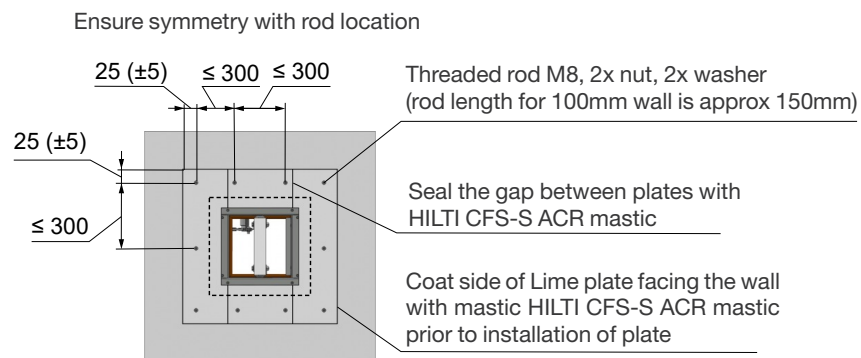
Outside solid wall construction - mineral wool, stuffing box, fire protection mastic and cement lime plate
